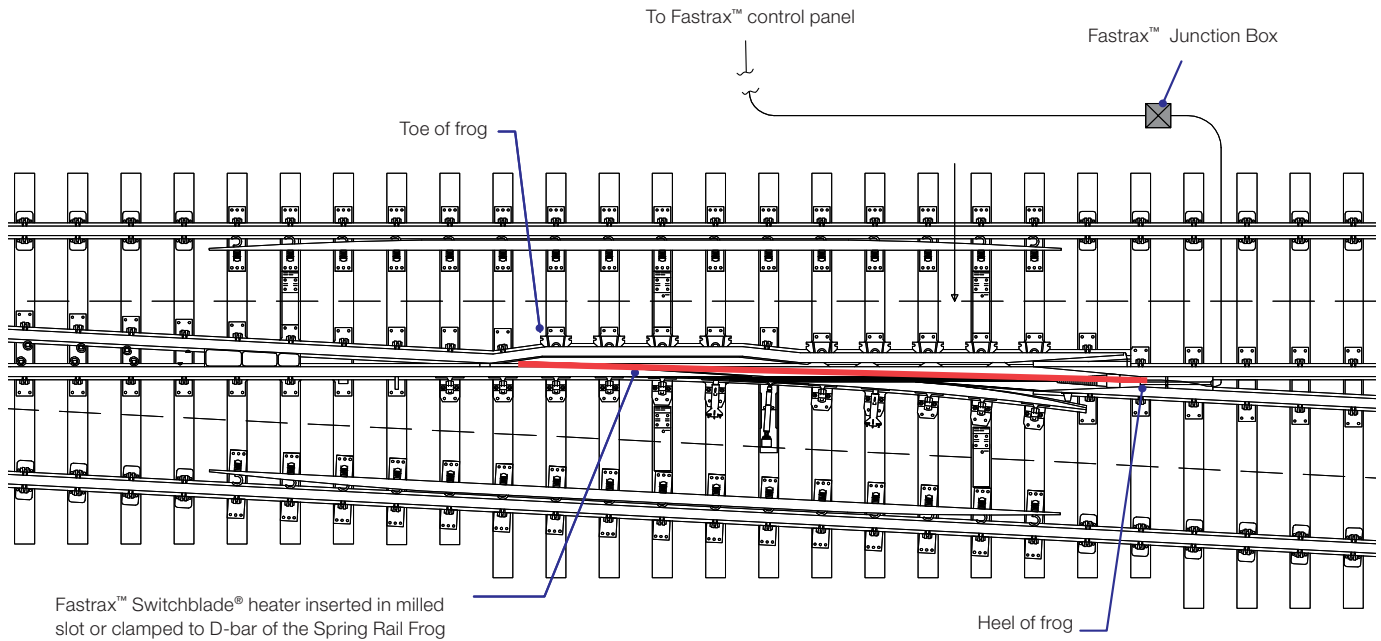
Typical Spring Rail Frog Heating Layout - Equipment Detail, All Standard Sizes (All Tie Styles)
